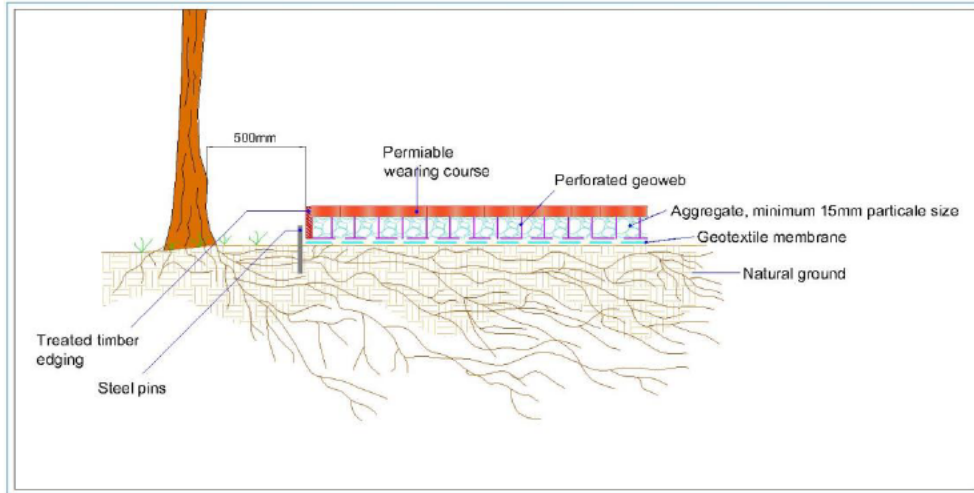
Typical cross-section for multi-dimensional confinement system using timber edging
